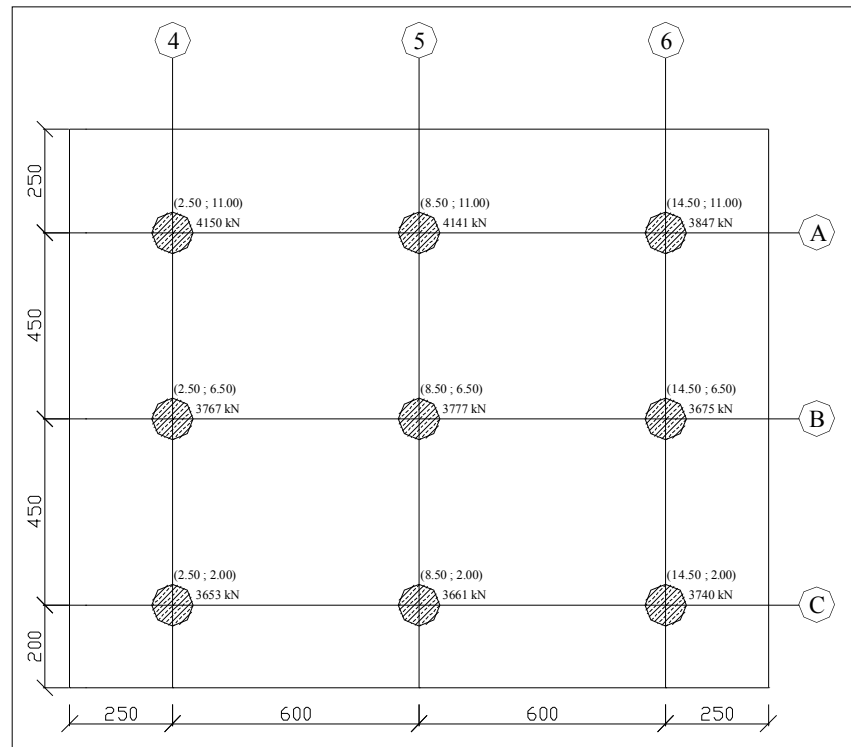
Pile disposition plan and pile loads (9 piles with 25m length)
